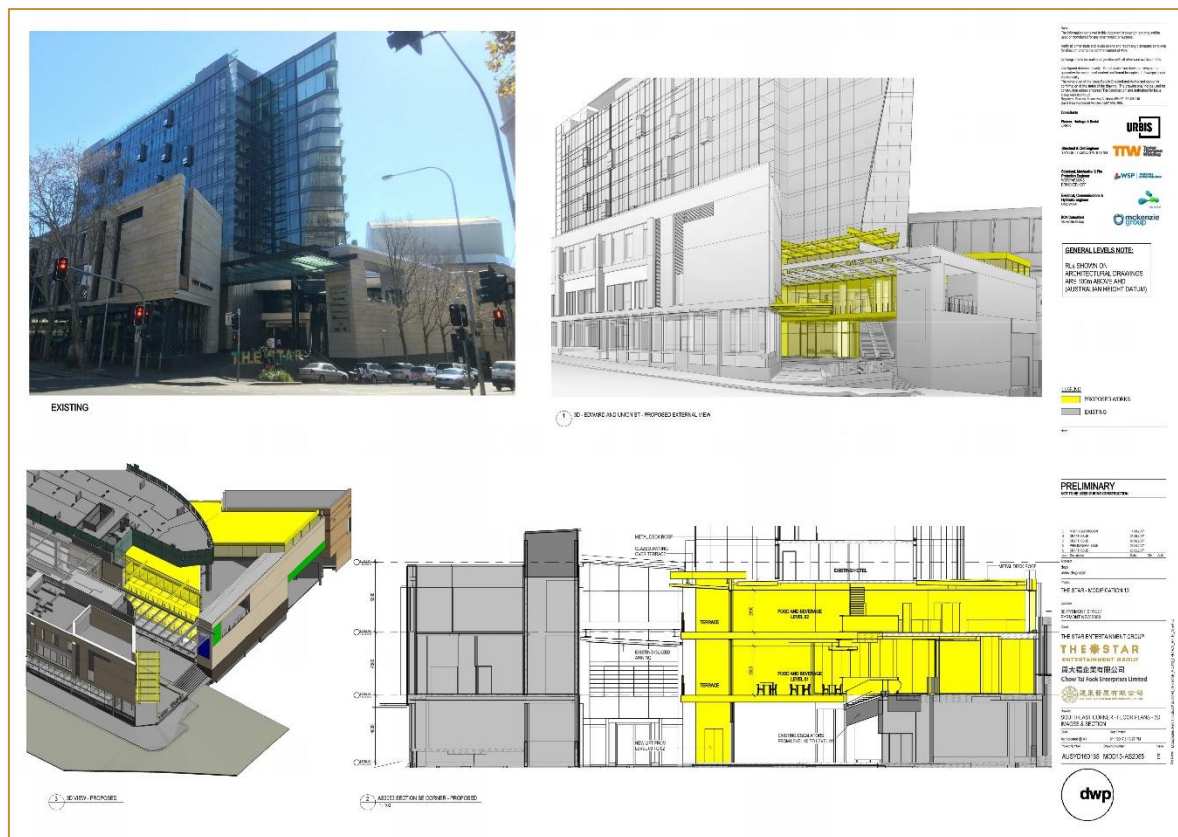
PROPOSED NEW UNION STREET FOOD AND BEVERAGE PREMISES
